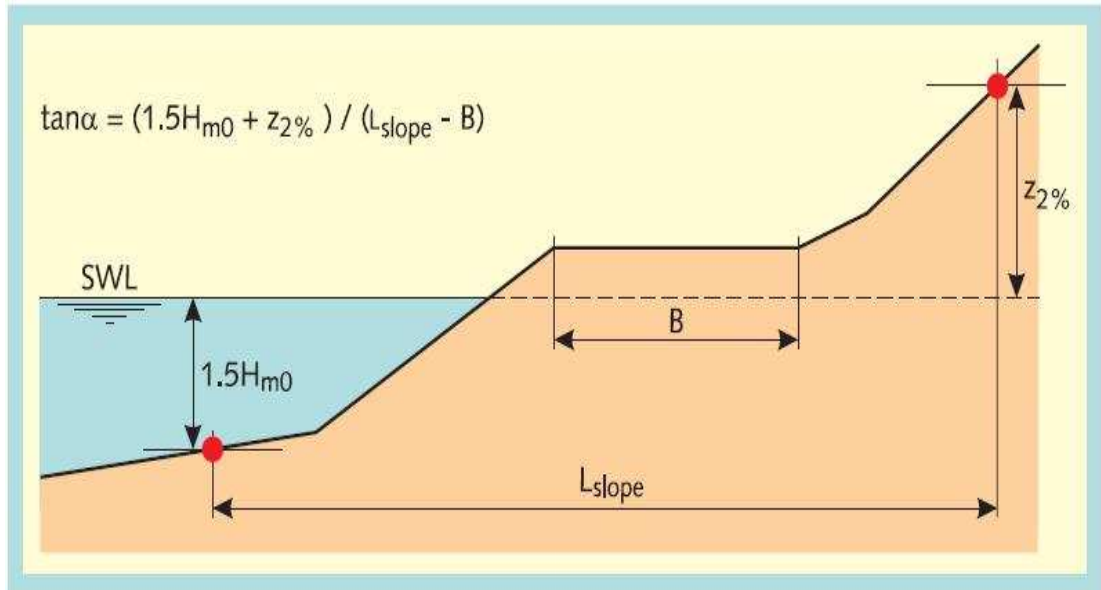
Definition sketch of slope (Source: Pilarczyk et.al., 1998)
